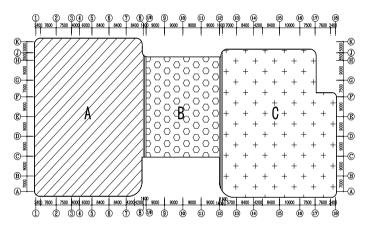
Schematic diagram of building layout (Unit A, B and C)
